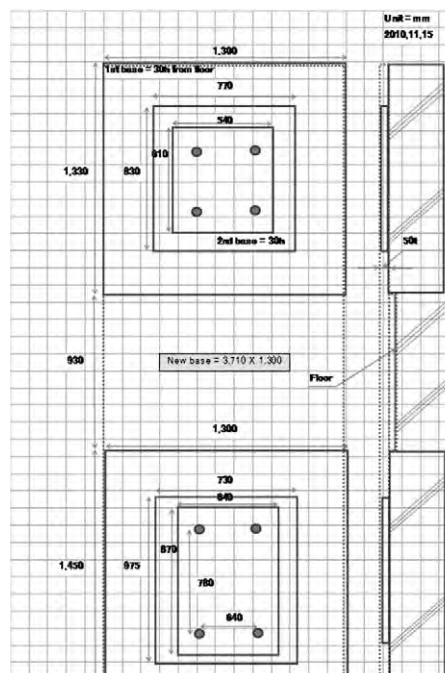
Example of foundation building for the lathe installation (Unit: mm)
